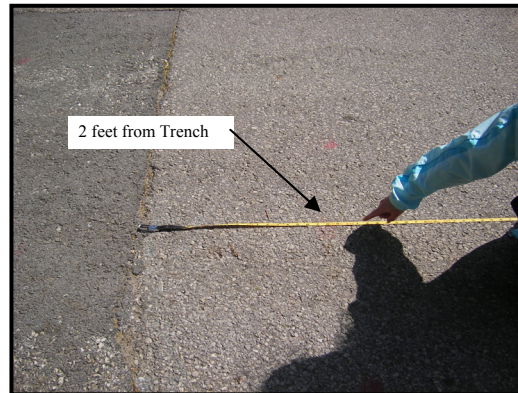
Condition of the pavement 2 feet west of Trench F at FWD testing location 8
